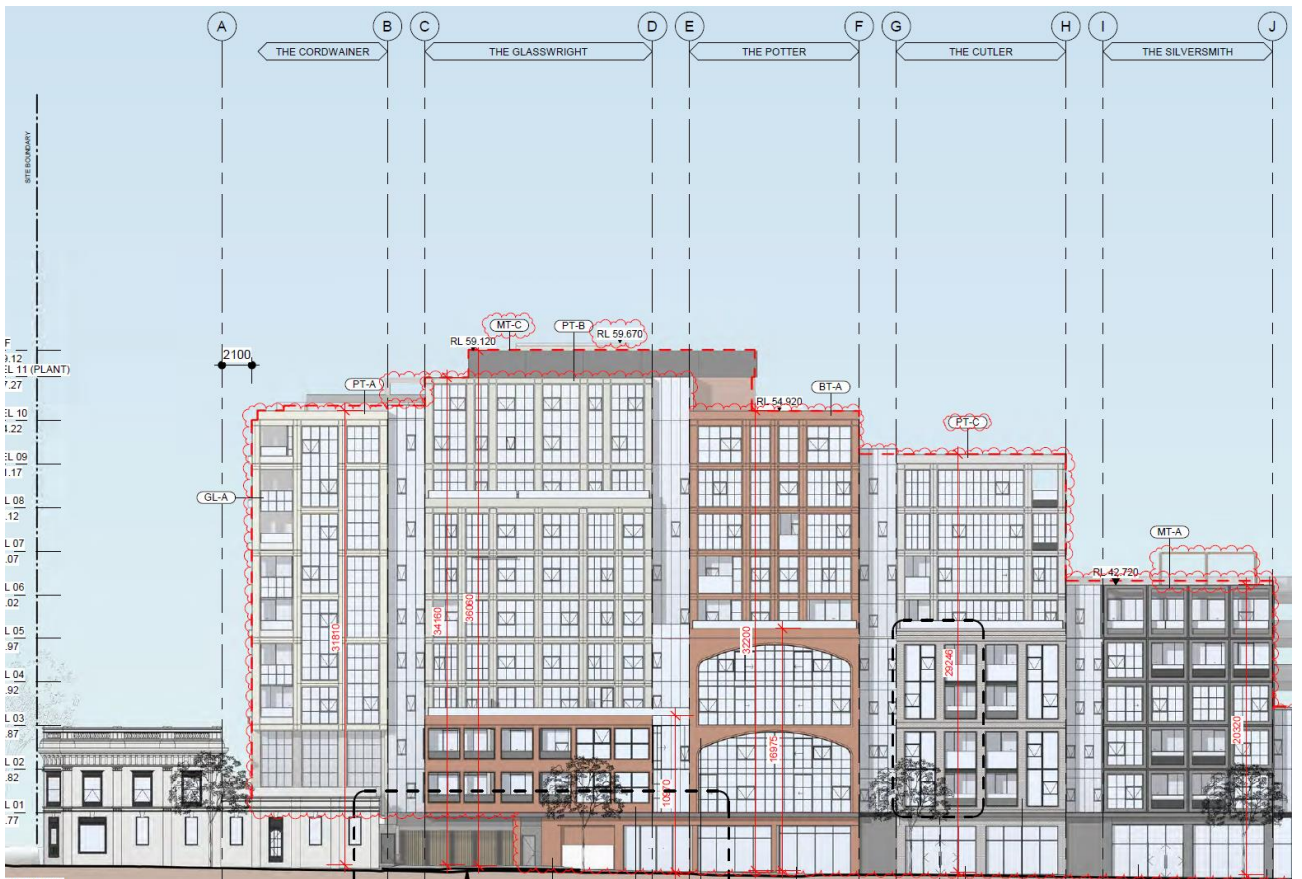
Proposed Wellington St Elevation (Grid A to Grid J)
